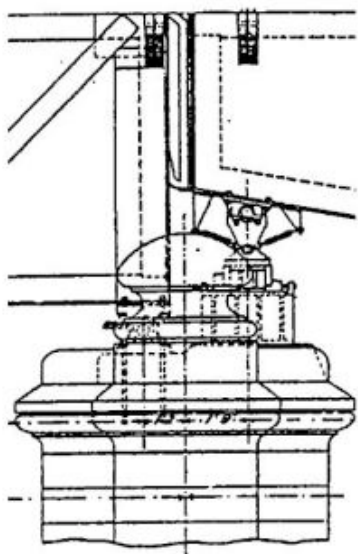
Glebe Island Bridge swing span drum. The main girders rest on the distributing girders and the drum pivots on the cast steel rollers
